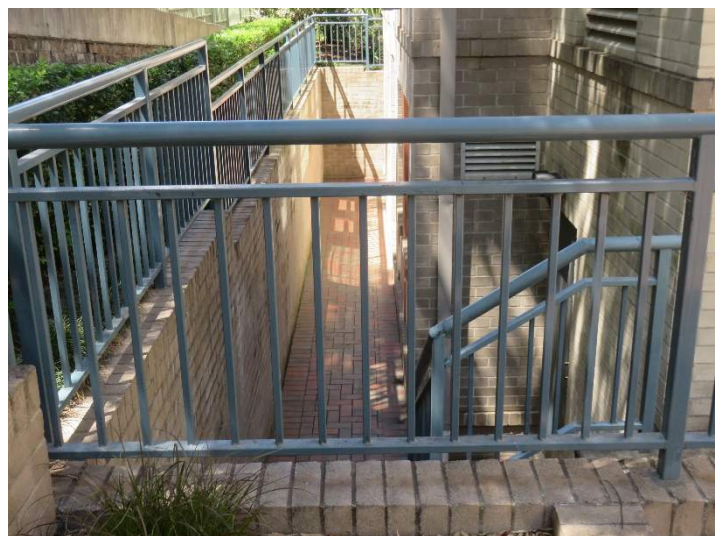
(Right) Looking south from the courtyard ground level down to the ground level around the remaining area of 'Wyalla'.
